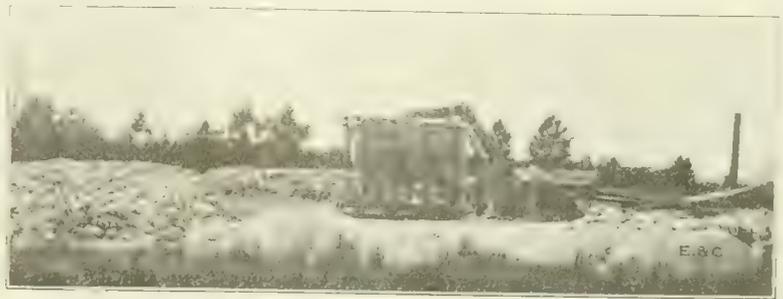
Crushing Plant. Note Method of Piling Uncrushed Stone Around the Plant.
